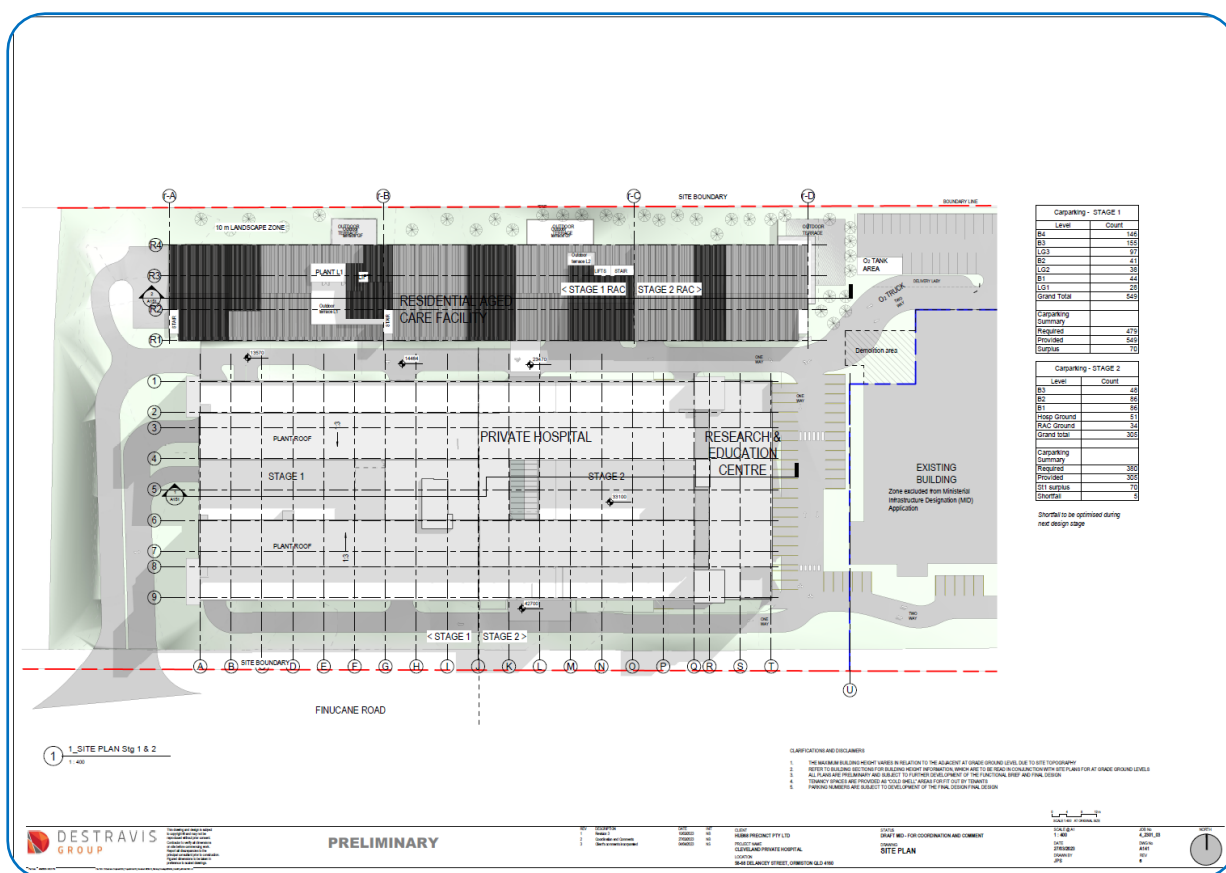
Preliminary Site Plan (Destravis Group, 2023)
